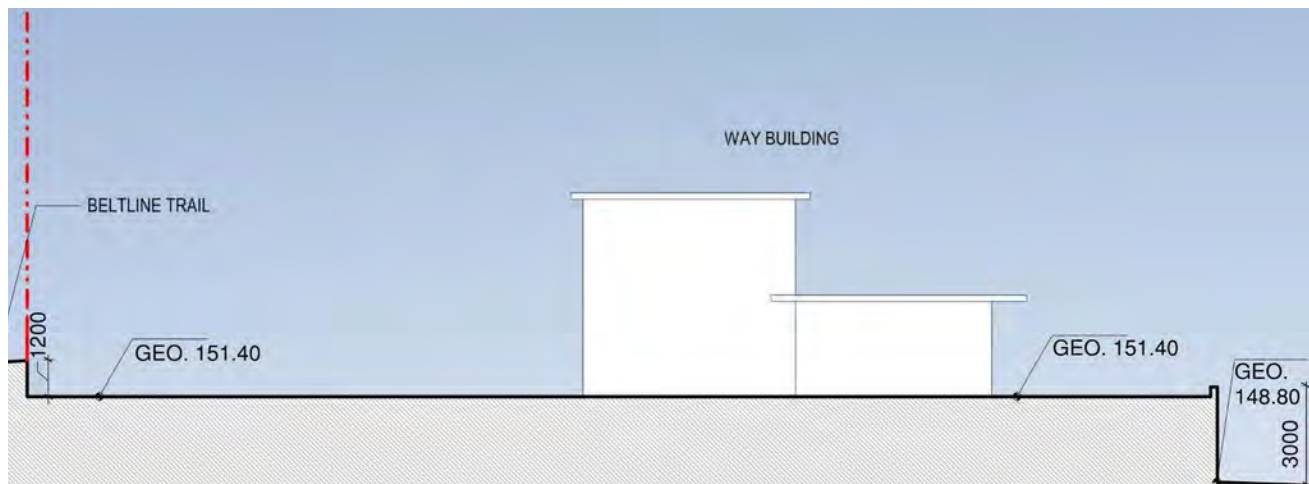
Site section 4- Beltline Trail and Track and Structure Building (Way Building)
